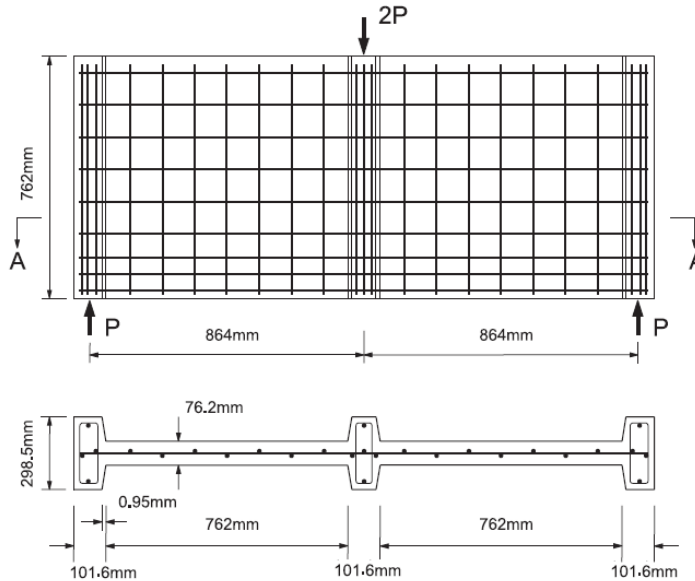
RC SHEAR PANEL BEAM W-2. GEOMETRY AND REINFORCEMENT DETAILS.
